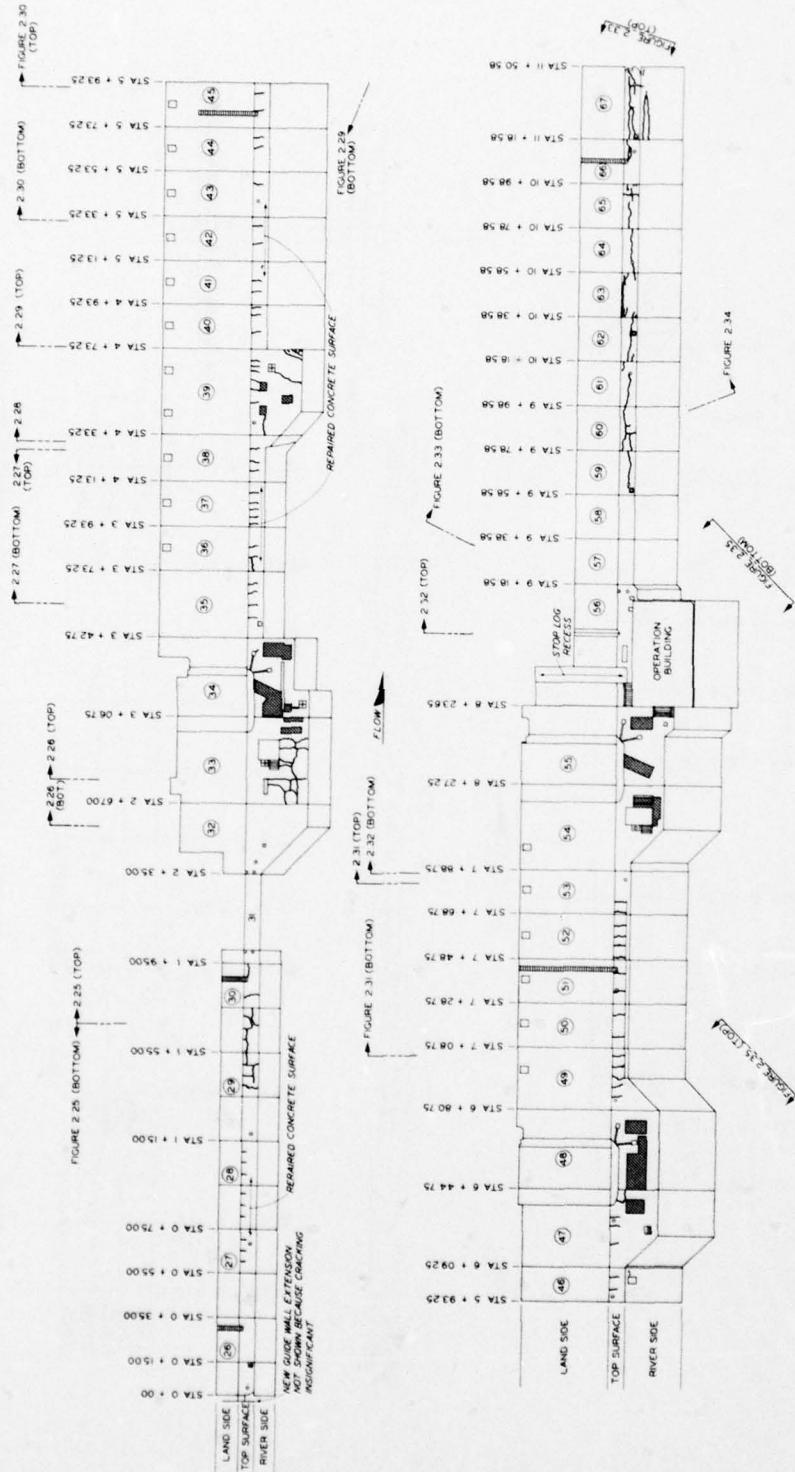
Surface cracks, river wall, Troy Lock and Dam, Troy, New York.
